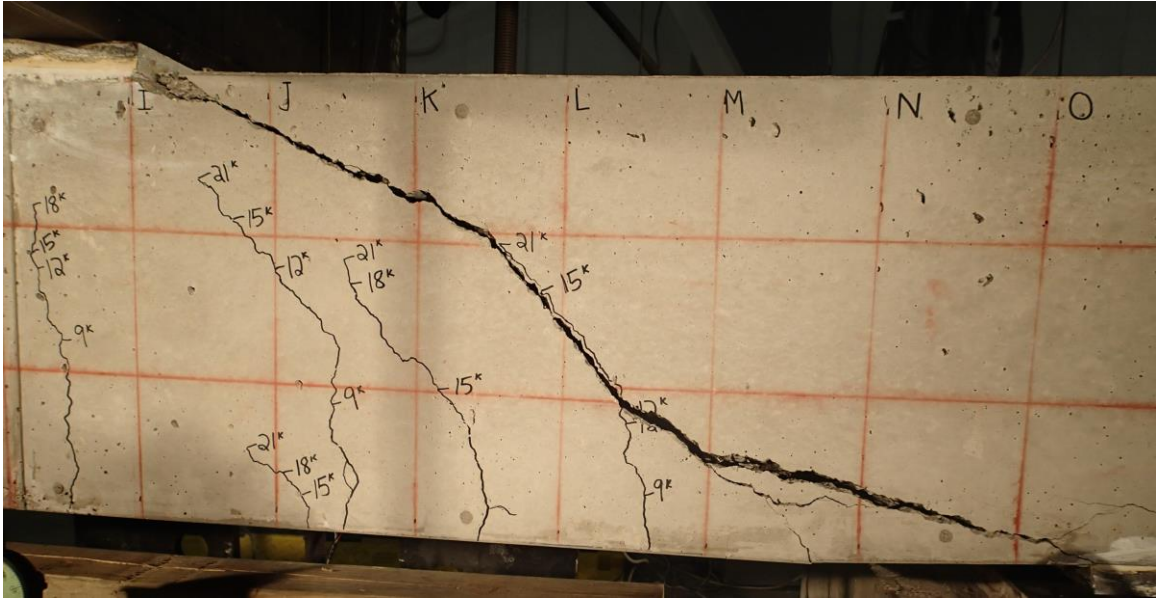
Specimen F-4: South Side Failure Inclined Crack
